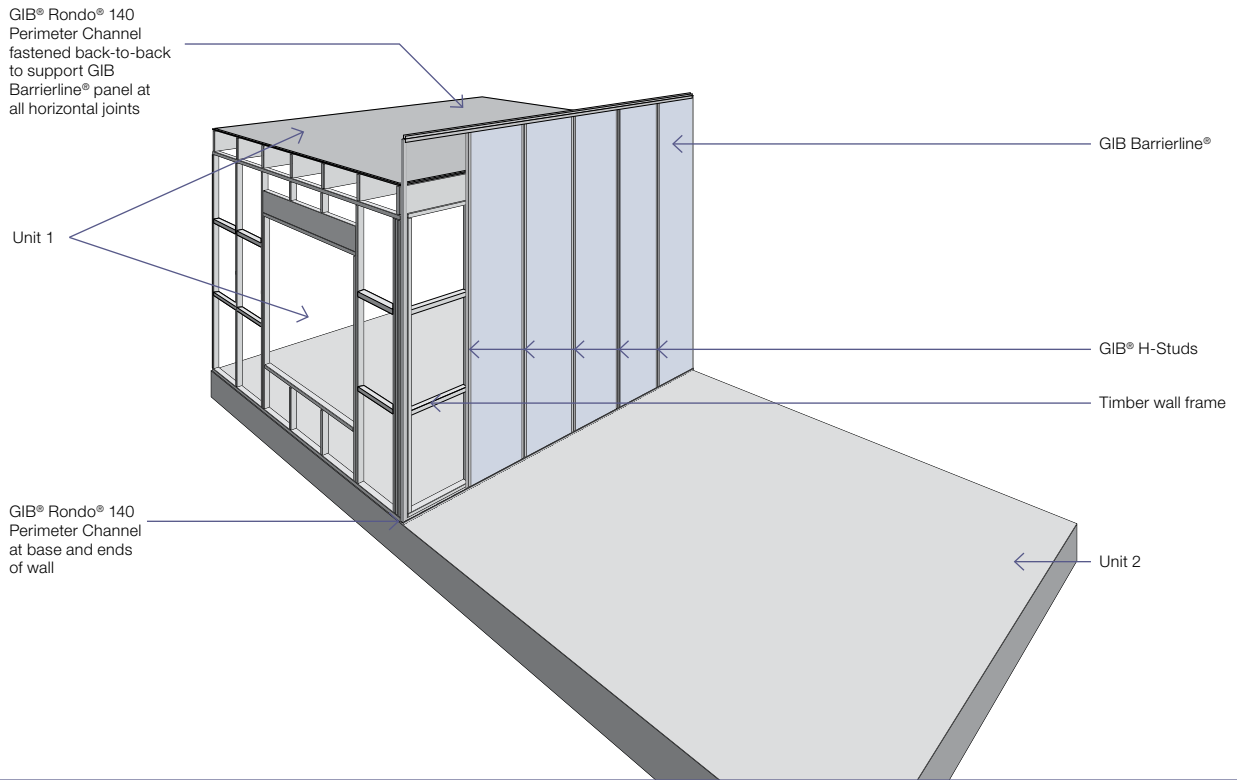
STEP 2 - UNIT 2 FRAME AND FLOOR INSTALLED
